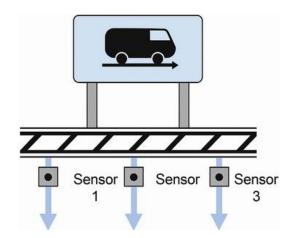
Typical Sensor Layout for Monitoring Braking Effects on a Railway Bridge.
